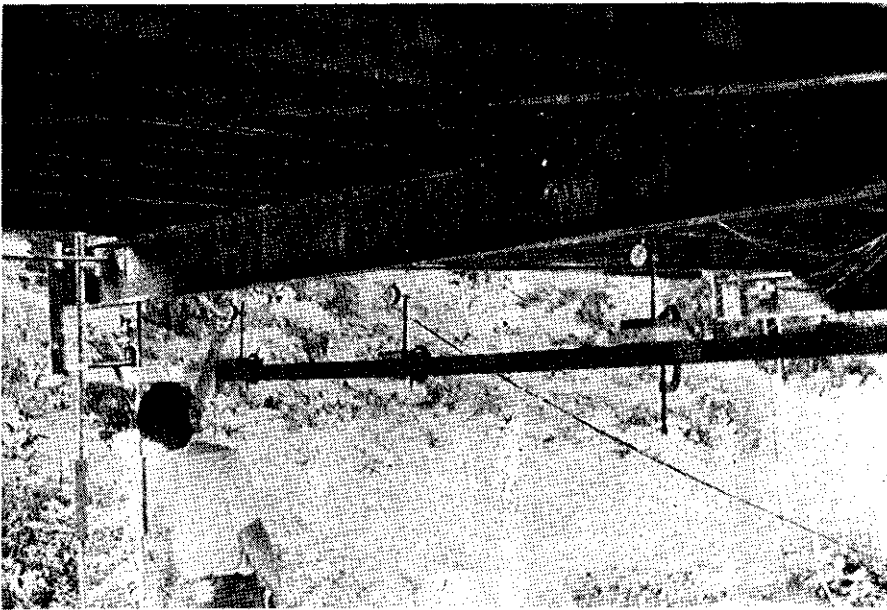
Photograph of deflection dial placement for floorbeam test.
